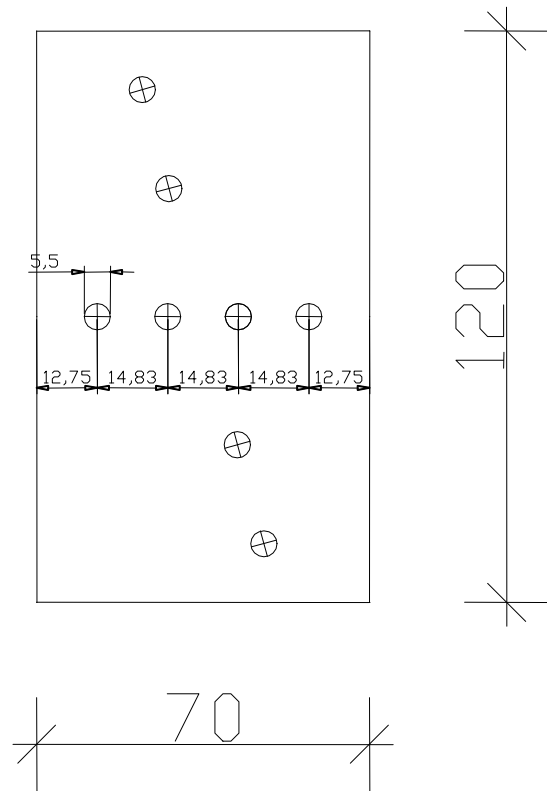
Joint detail for a mid joint (dimensions in mm)
